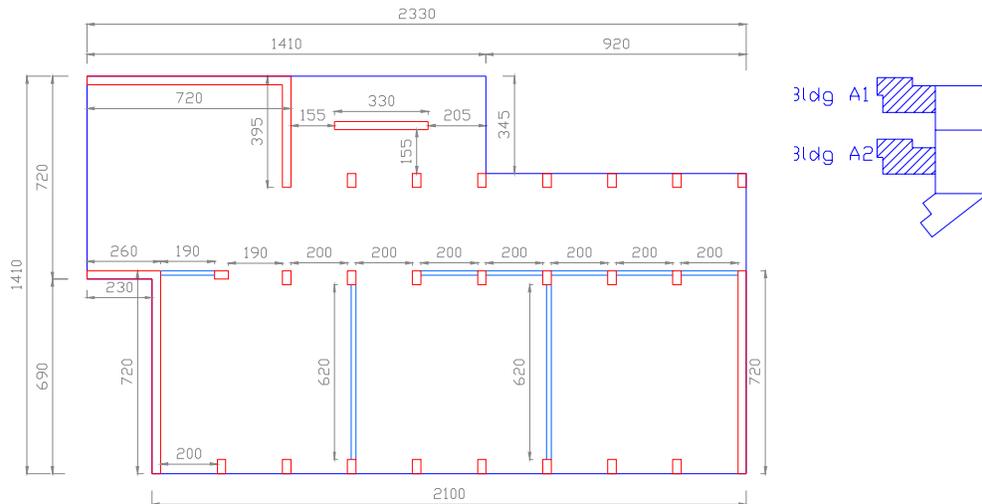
Structural floor plan for building C-13-04A. All the columns have dimensions of 0.3m x 0.5m. The thickness of the reinforced concrete and masonry walls were 0.3m and 0.16m, respectively. Dimensions are in cm.
